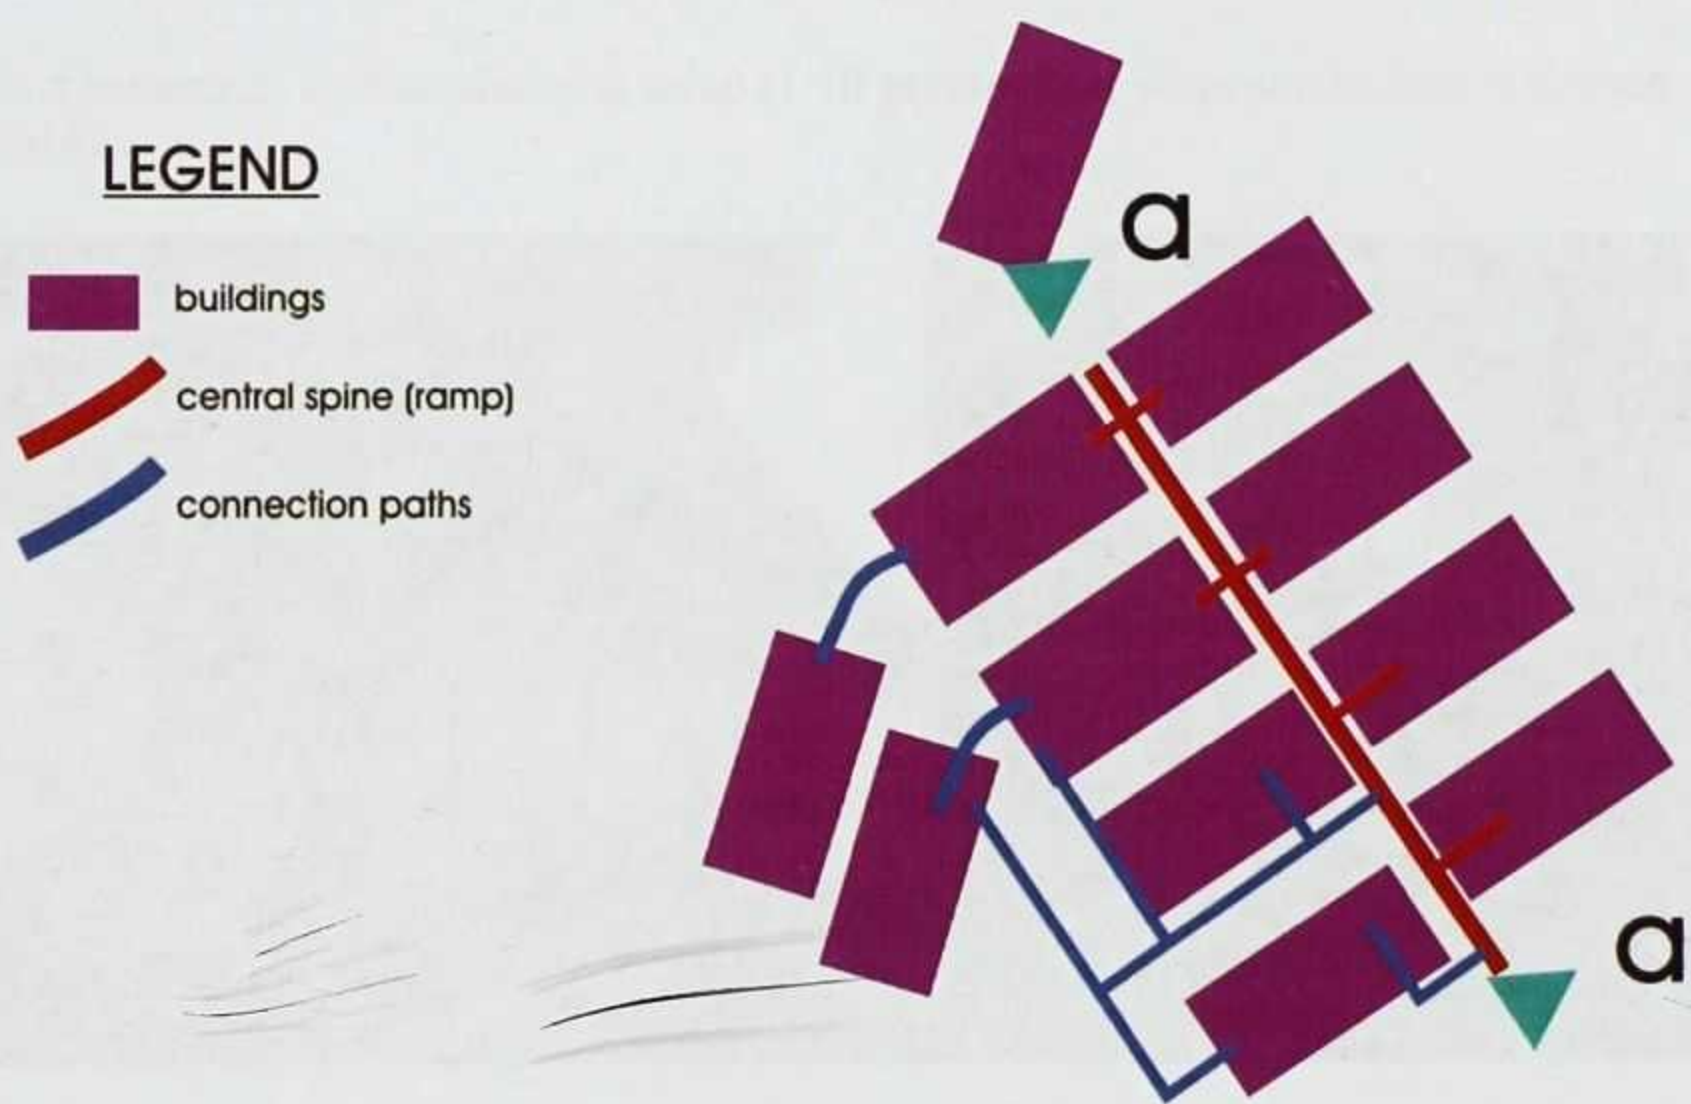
central ramp as accessibility element connecting different levels on site (Source: BLOH, 2010)
